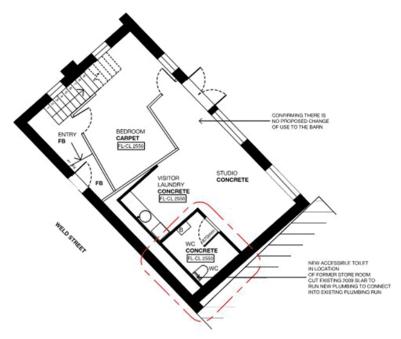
floor plan of the barn showing the location of the proposed bathroom.
